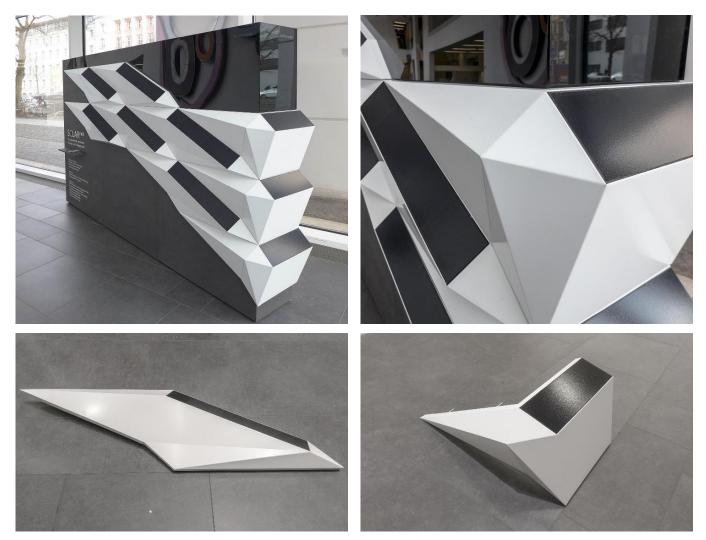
Realized SOLARshell demonstrator | facade, corner detail & west and south facade element
